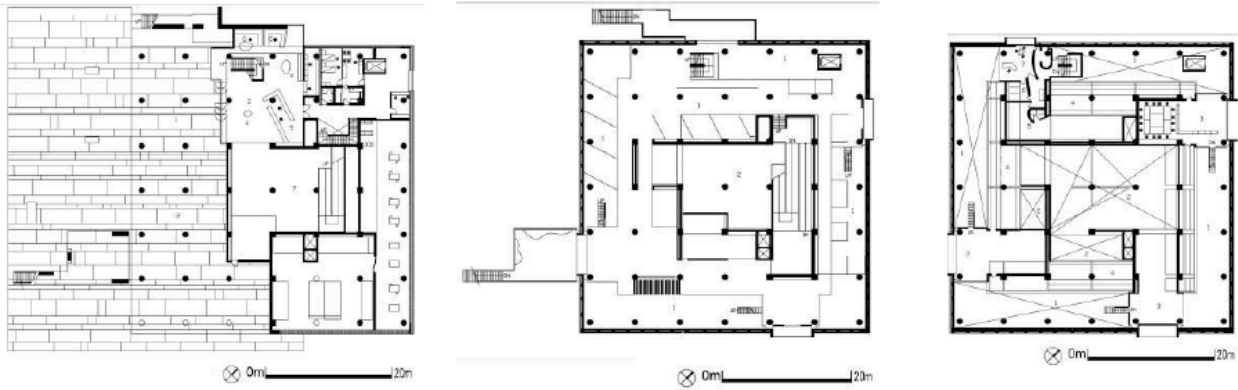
Ground floor plan (left), first floor plan (middle), and mezzanine plan (right) of the Tokyo Museum of Western Art. (redrawn by the authors).
